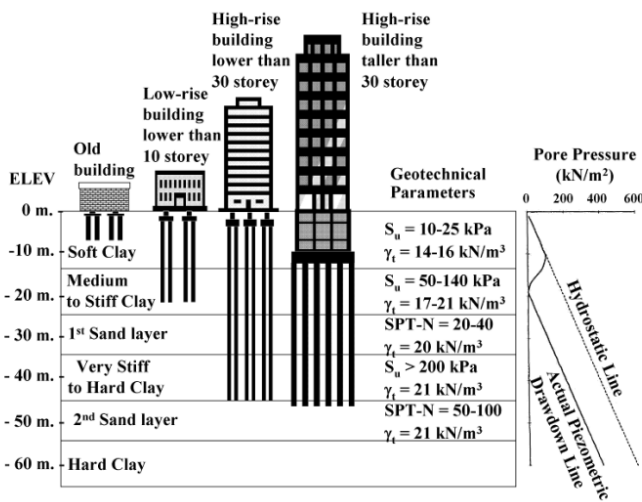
Typical design of superstructure using Piled Foundation concept in Bangkok subsoil
